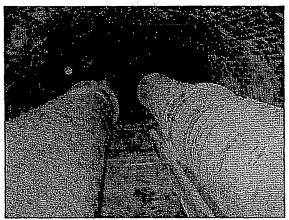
Brick wall pipe supports with arched opening at bottom center
